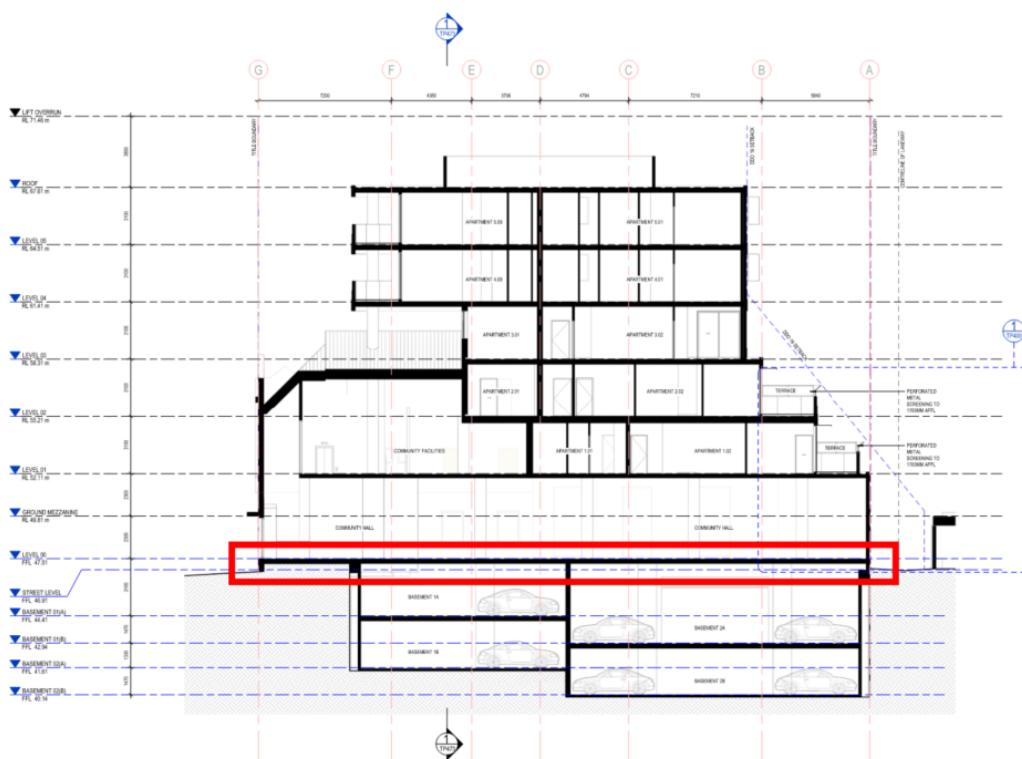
KUD - Proposed Section BB - 87a Application' drawing set--TP472 Rev E - 31.10.2025
